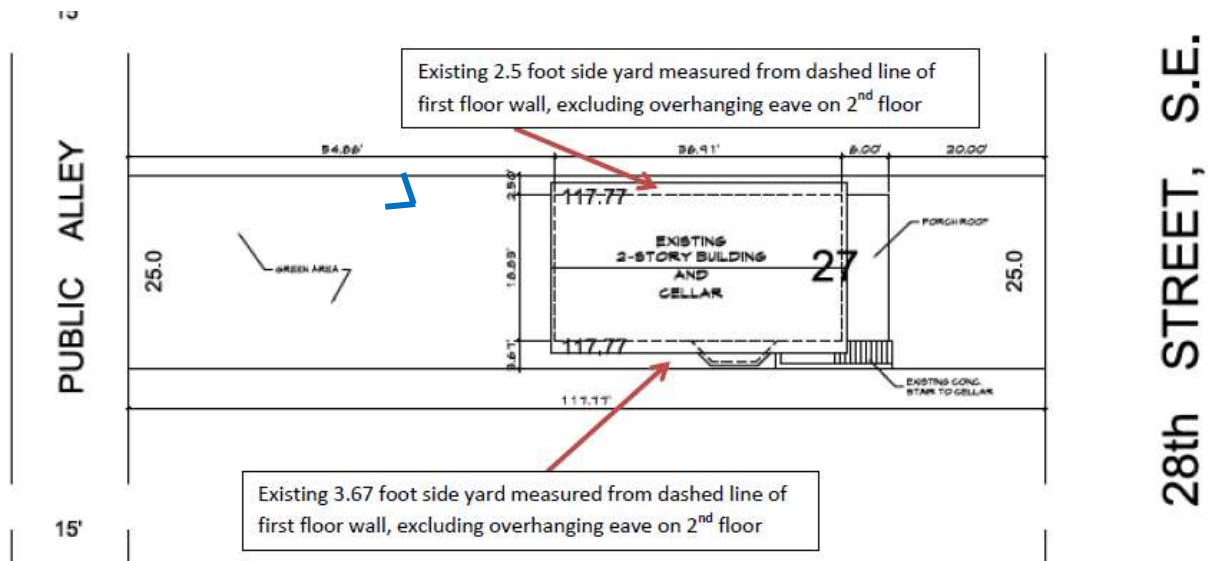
Site Plan. Because the southern side yard should be measured from the farthest extension of the bay, that side yard dimension is significantly less than indicated by the applicant. OP has requested additional information from the applicant.
